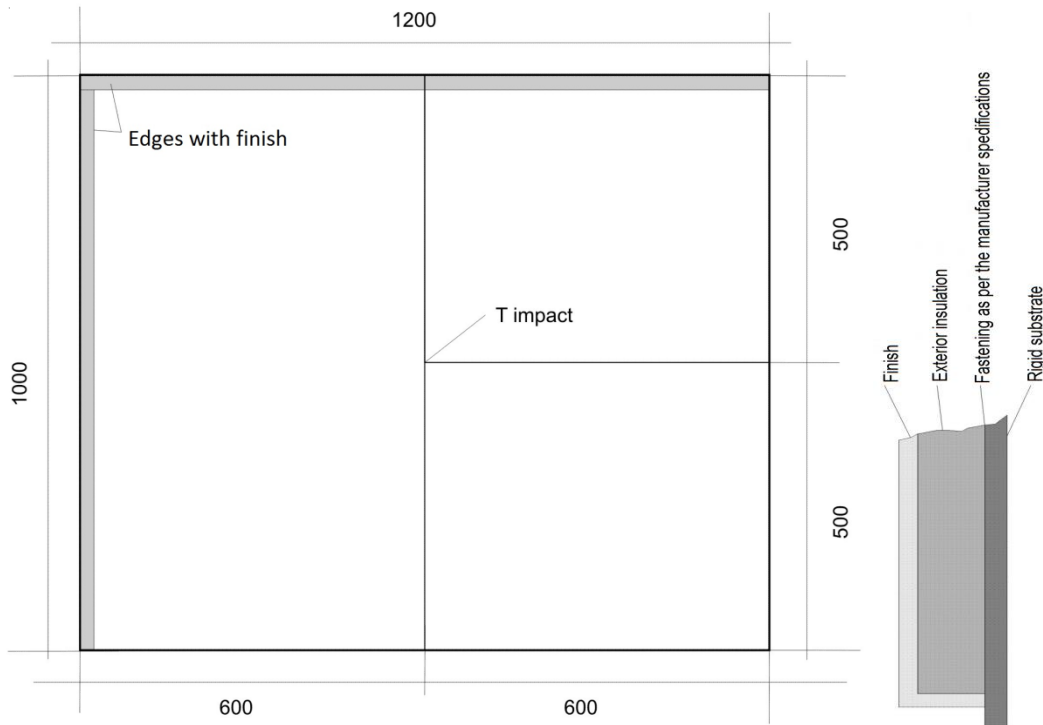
EIFS test specimen comprised of 3 sections, shown in plan view and cross section (dimensions in millimetres).
